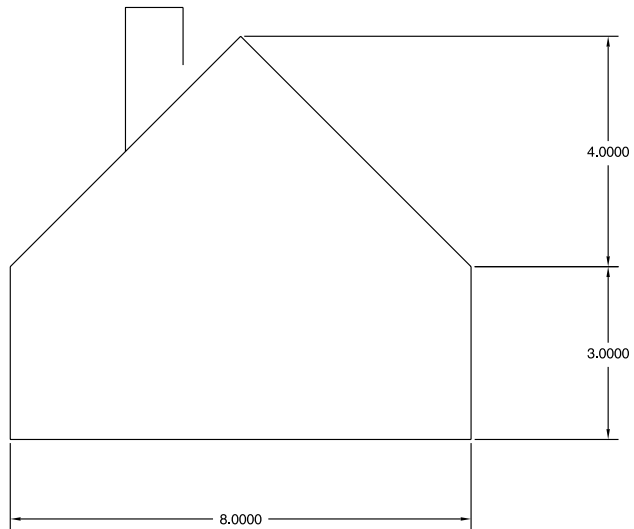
HOUSE DRAWING WITH DETACHED CHIMNEY
